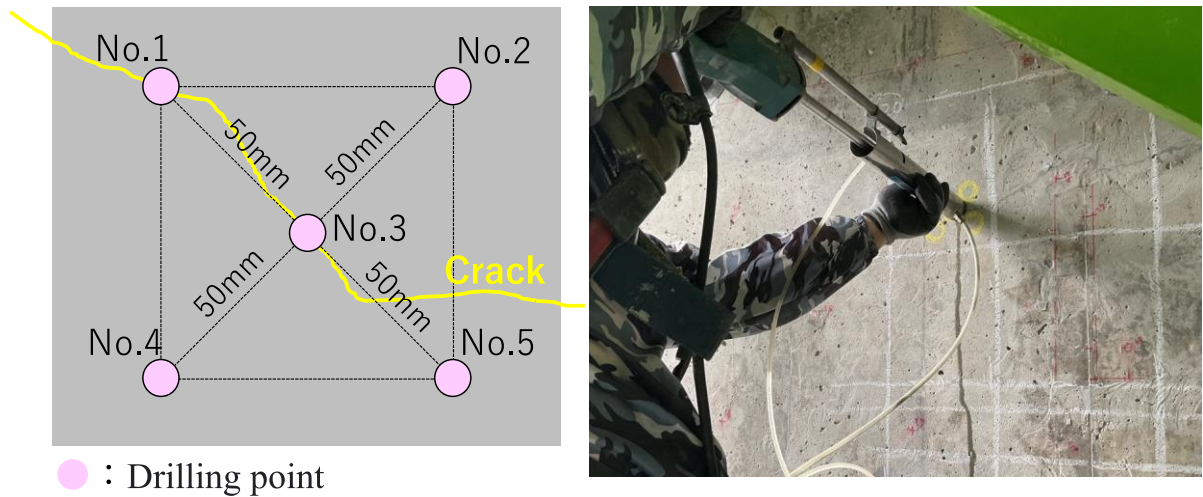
Excavating five points from #1-5 on the cracked area (left) and a photo when fluorescent epoxy impregnation was carried out (right).
